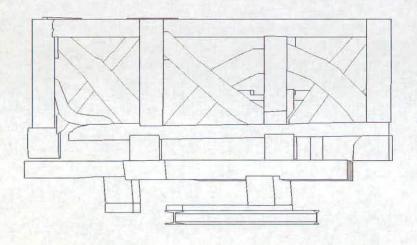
Sectional views: sheet 1 of 6 (drawing by Bill Blake/Andy Crispe)
